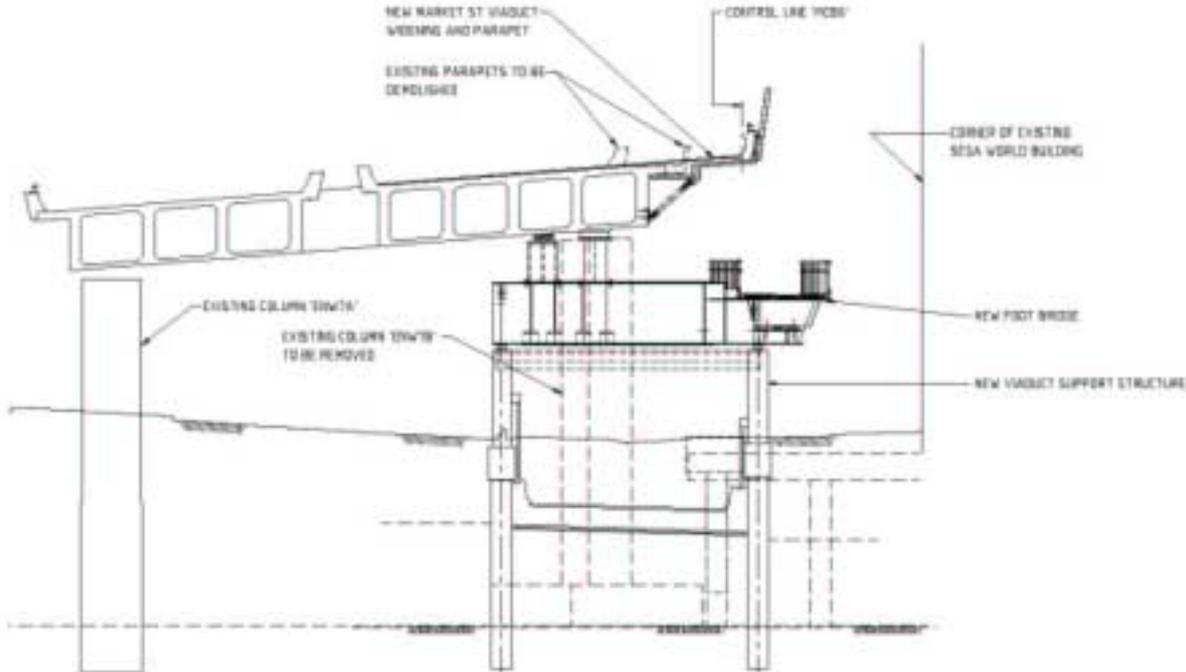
Elevation of Market Street Widening at Concrete Box Girder Span and Column Relocation
